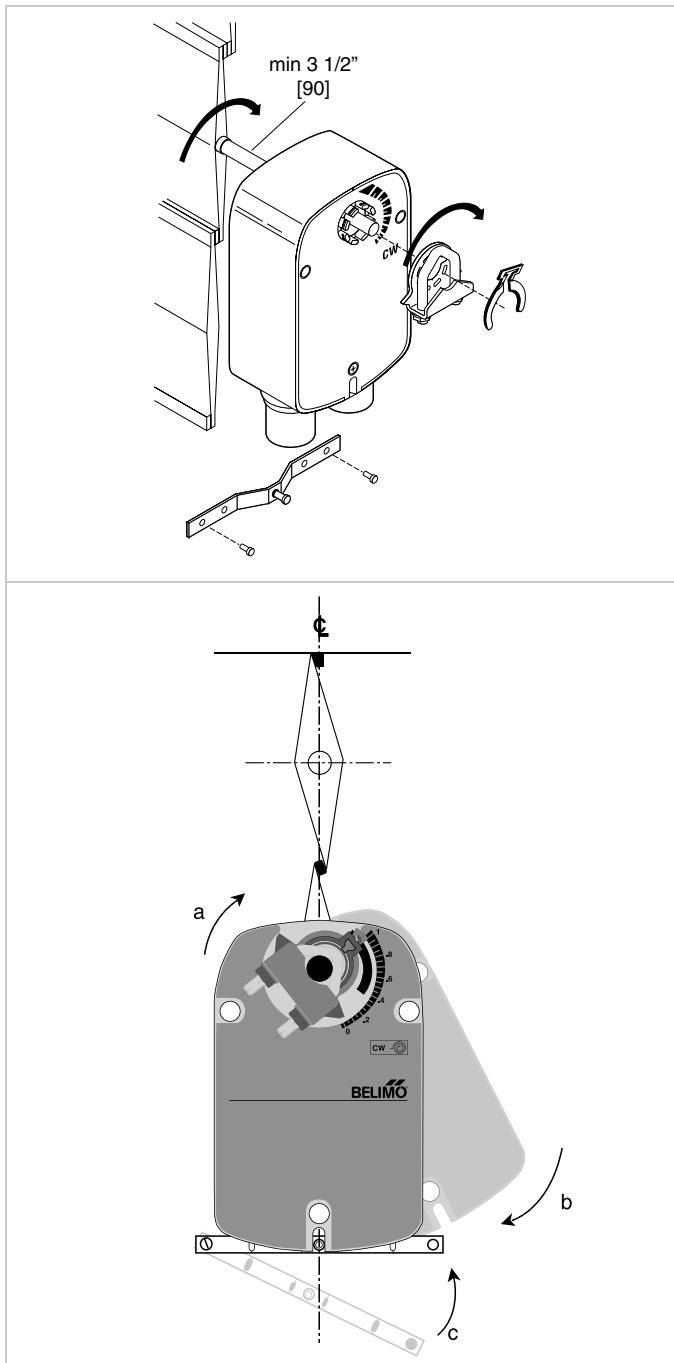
FIGURE B – Standard Mounting (Dimensions in Inches [mm])
